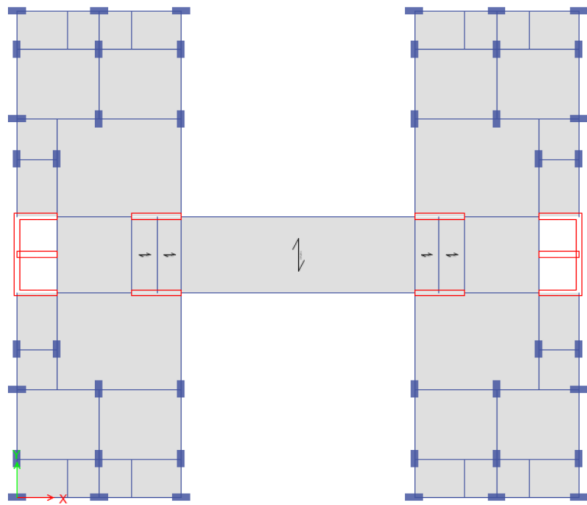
Model 6 Hypothetical plan with 40% height + 5% distance connection of building
